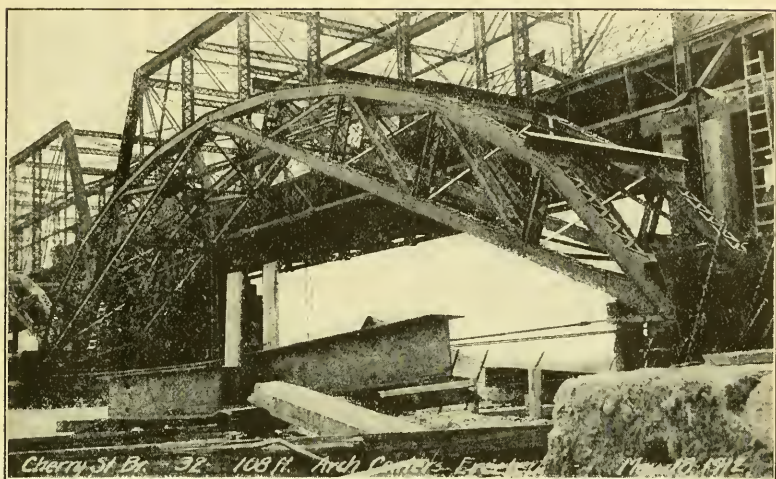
THREE-HINGED ARCH CENTERS FOR SUPPORT OF 108-FT. ARCH FORMS.
